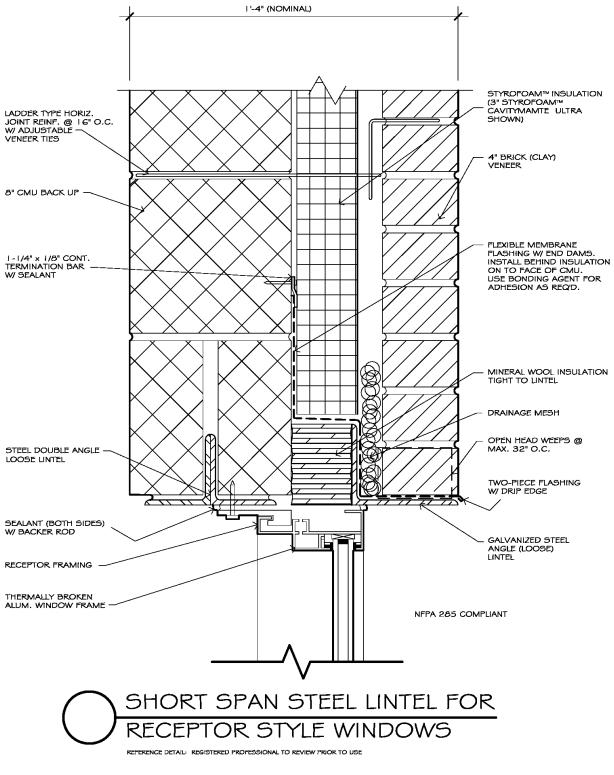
Window / Door Opening Detail w/Mineral Wool
